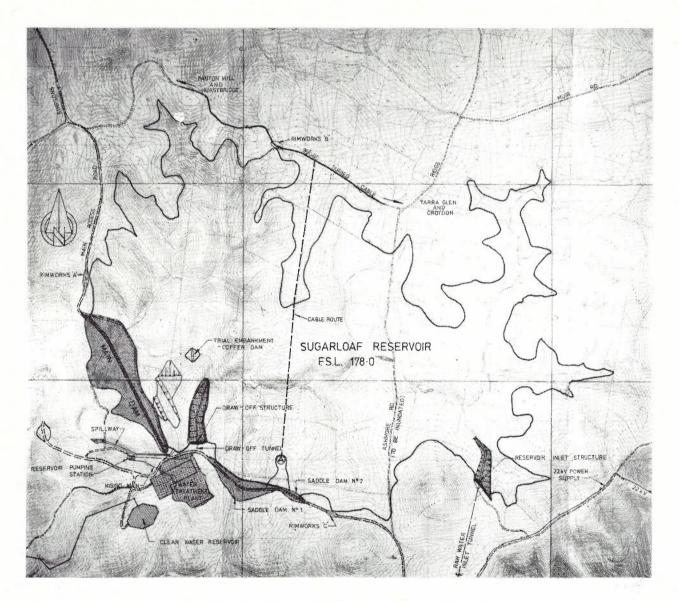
Sugarloaf Reservoir Project — General Layout.
